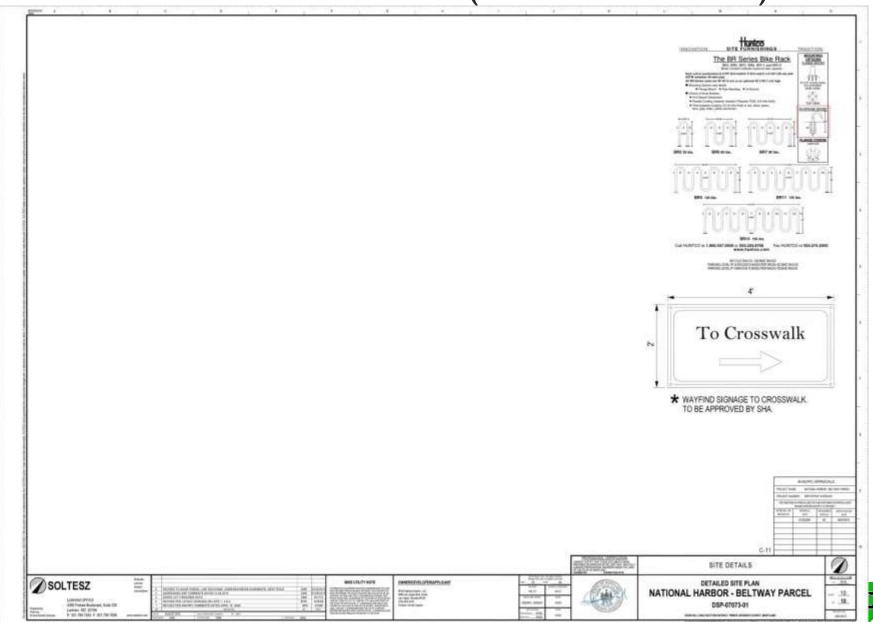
DETAILED SITE PLAN SET (PAGE 9 OF 10)
